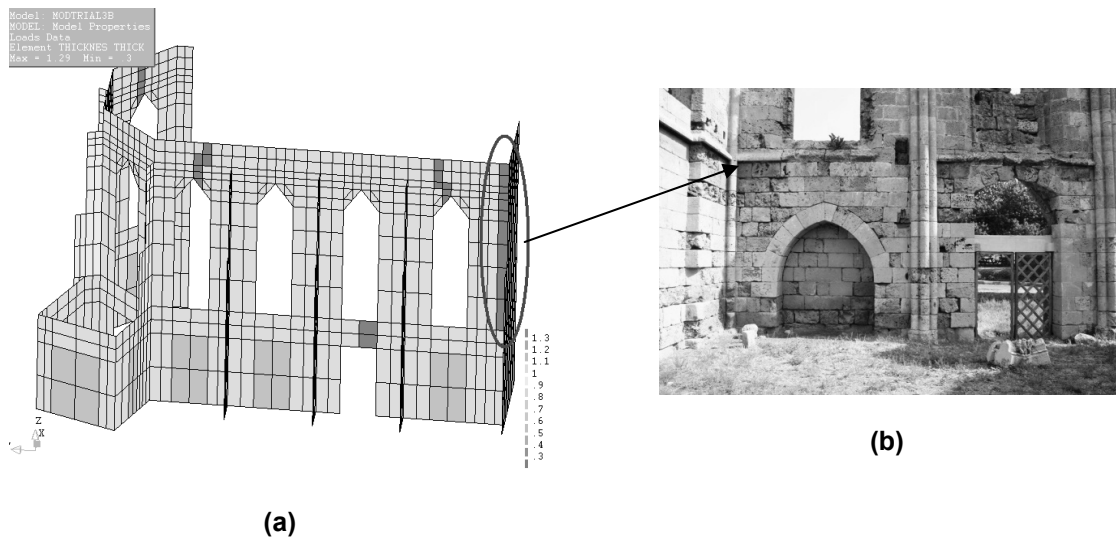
Model definition (a) of possible weakness in connection between North and West façades and damage in the lower part of the wall (b)
